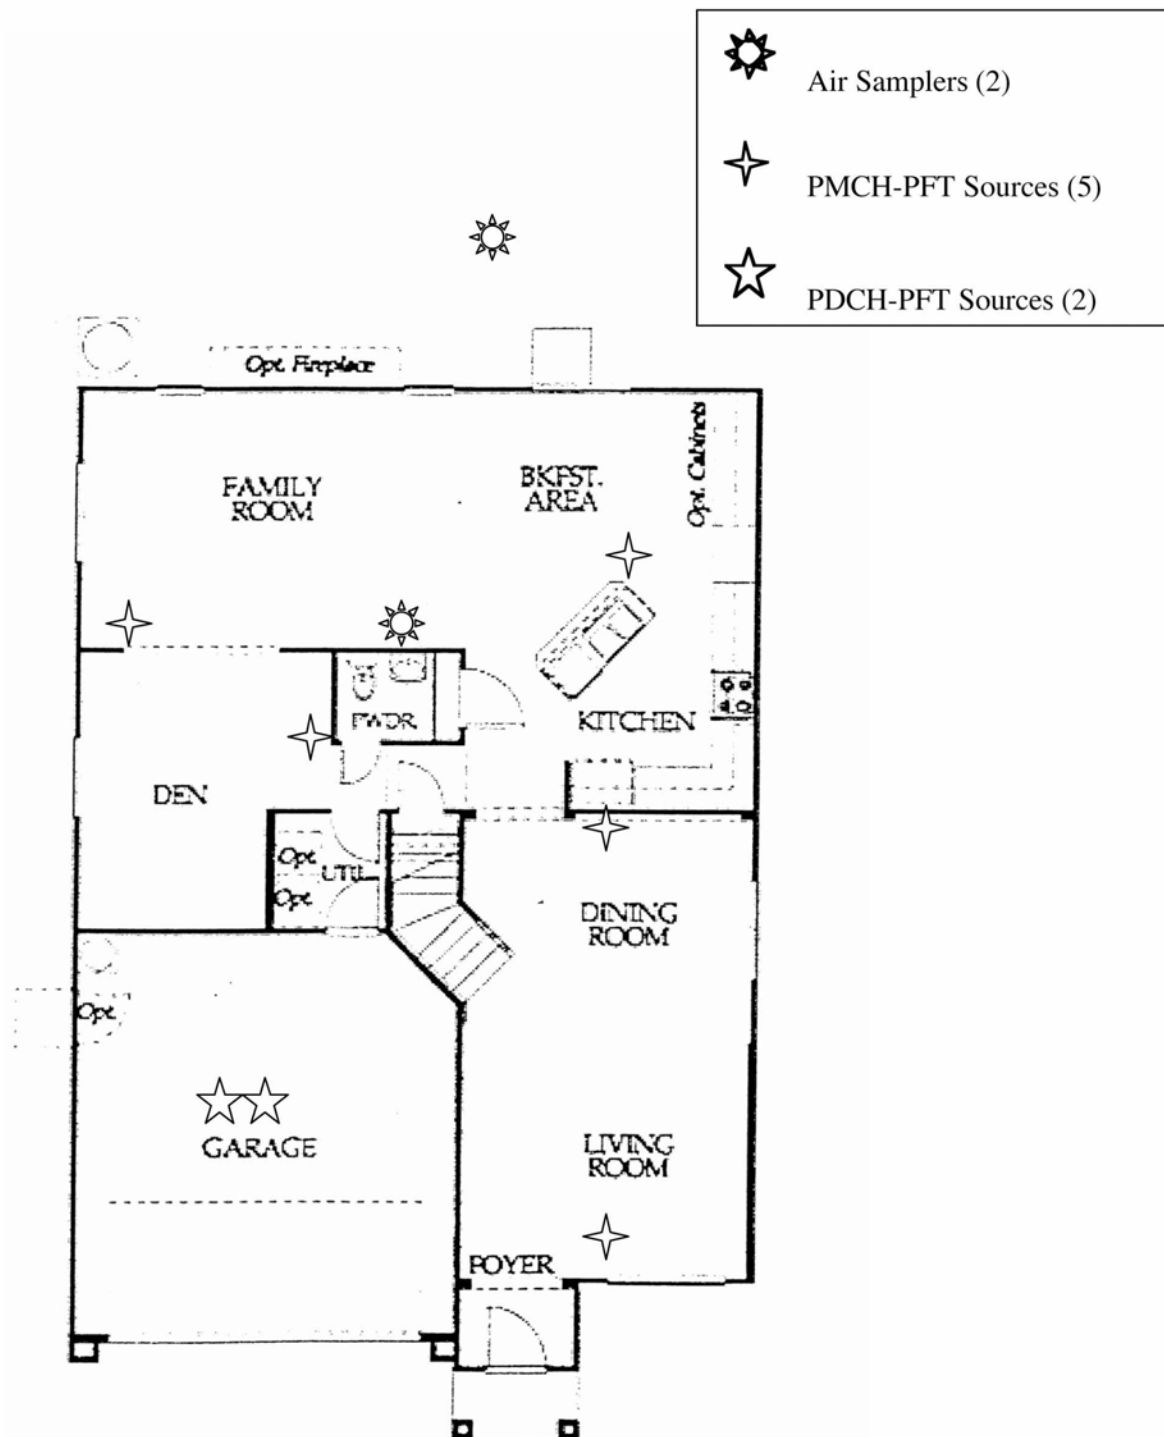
Floor plan of P3 first floor, depicting the locations of the air samplers and the PFT sources.
